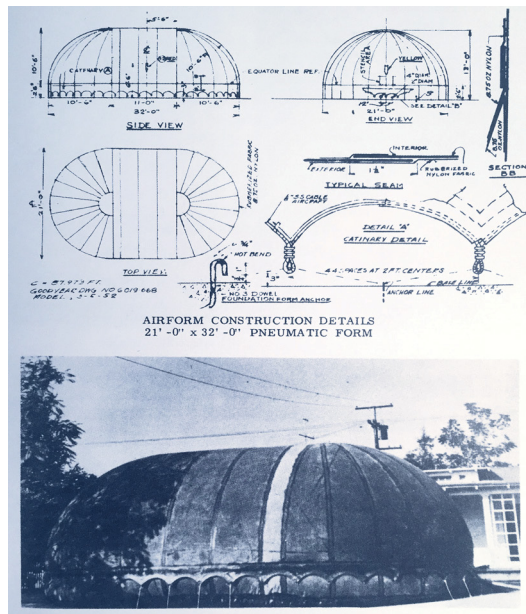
Plans and section of catenary vault for Airform Construction (Head, 2011).
